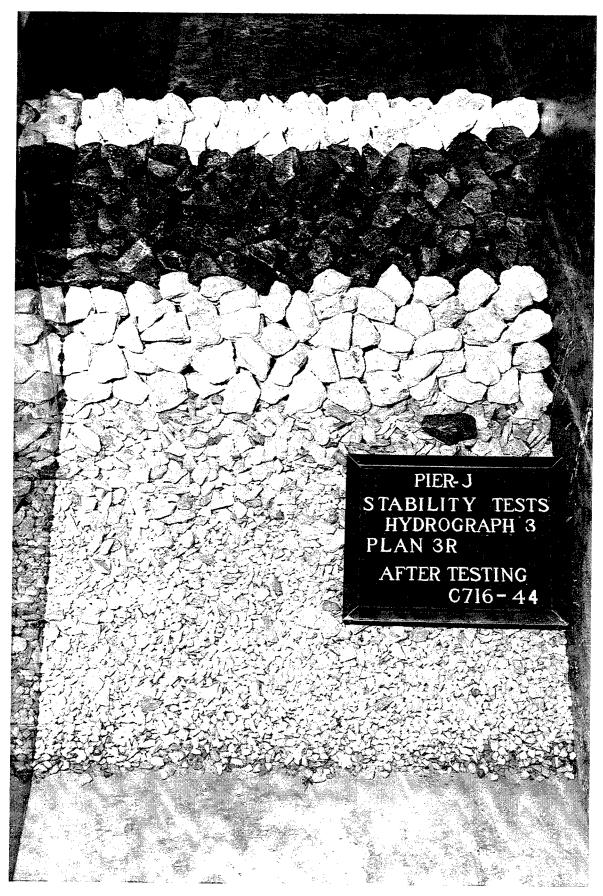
Harbor-side view of Plan 3R at the conclusion of testing
